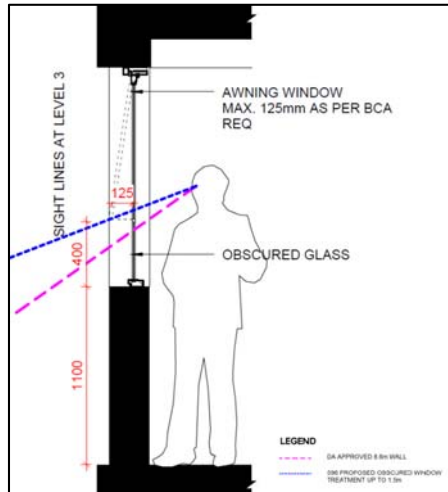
Privacy Window Treatment Details to southern windows of Level 3
